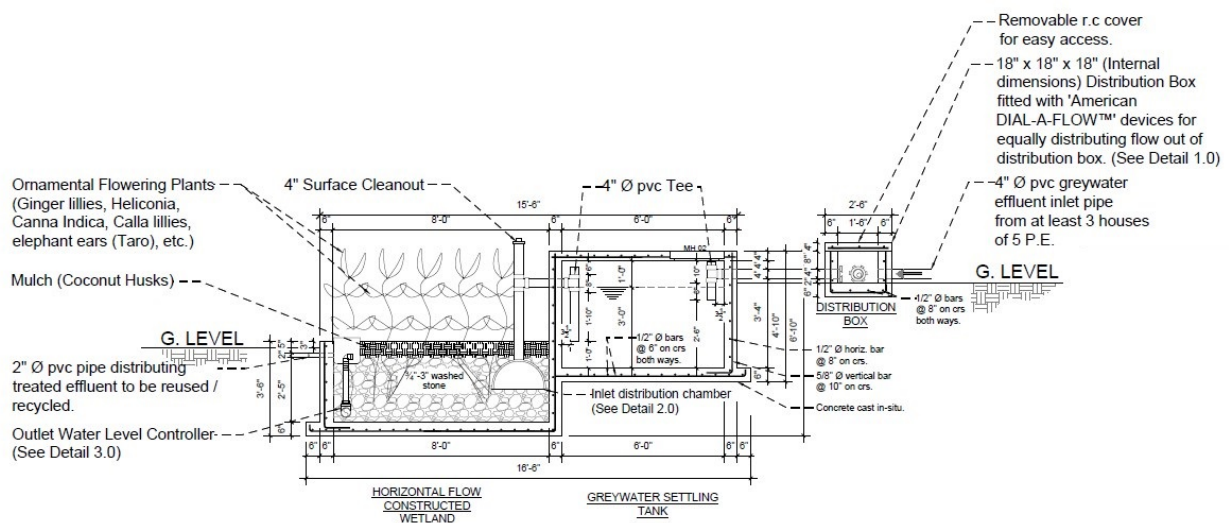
Figure I Typical layout of Greywater Treatment system – Setting Tank and Vertical Constructed Wetland
